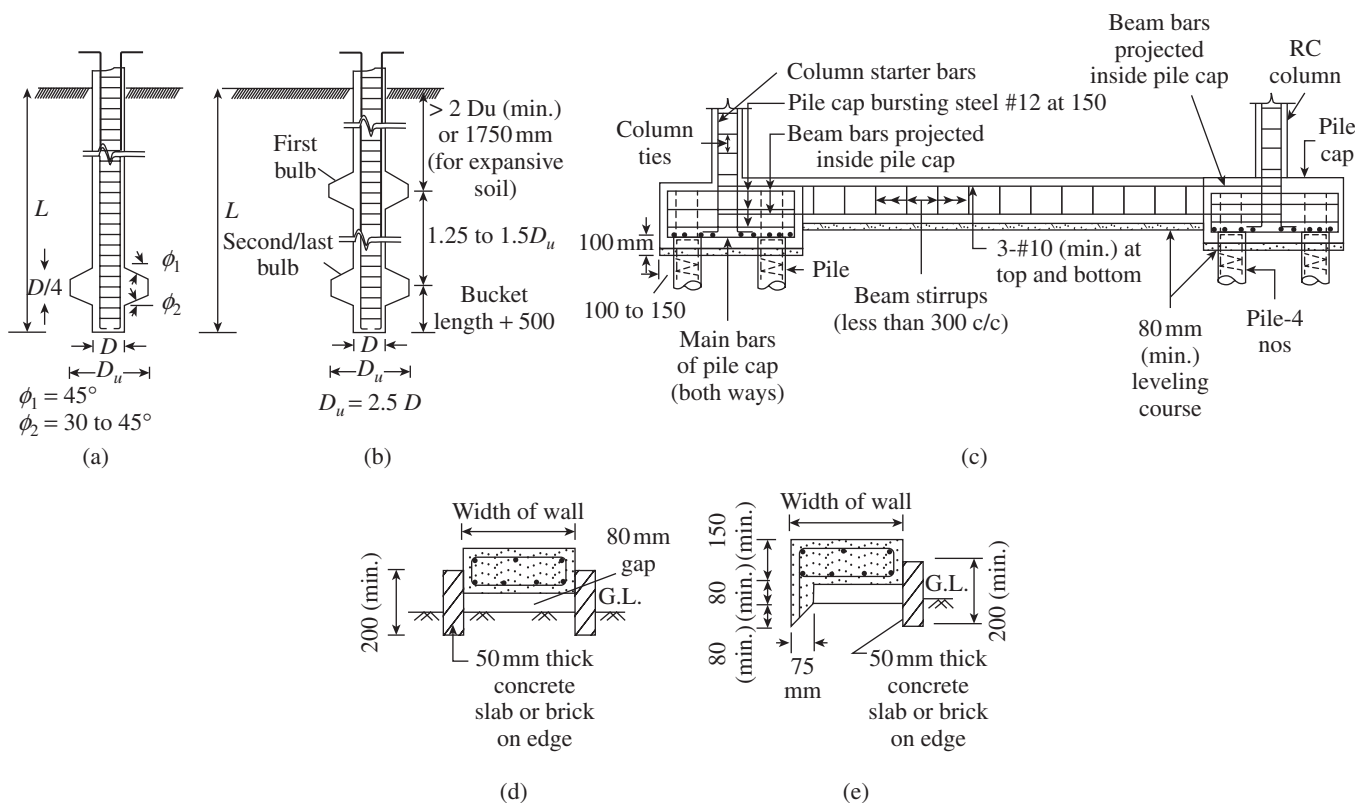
Typical details of bored cast in situ under-reamed pile foundation (a) Section of single under-reamed pile (b) Section of multiple under-reamed pile (c) Typical longitudinal section of grade beam (d) and (e) Typical section of grade beam
